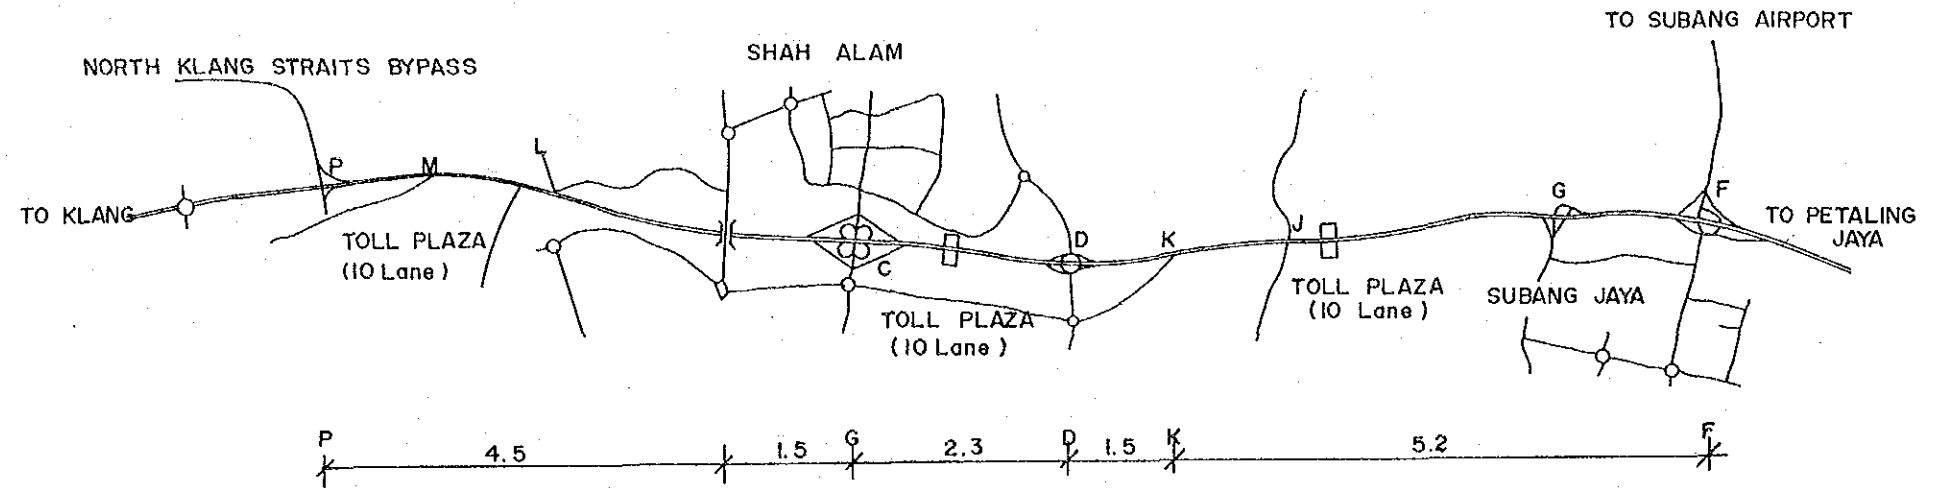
Proposed Traffic Control and Management System Installation Plan for New Klang Valley Expressway - 37.0 km
